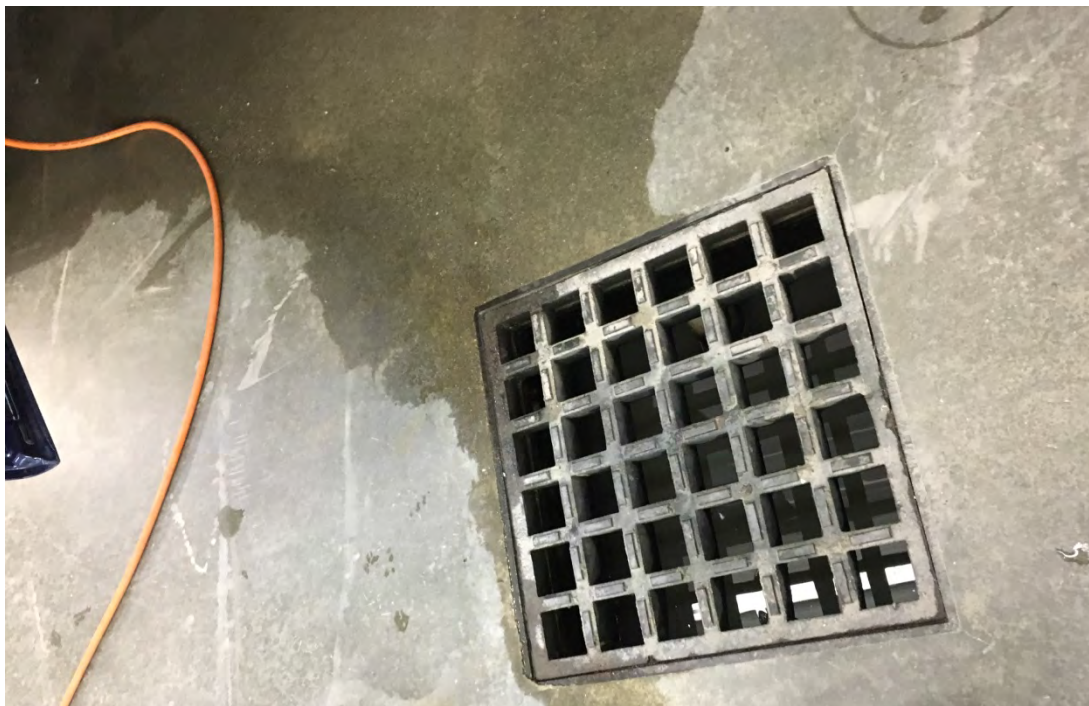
13 Stebbins Street: A floor drain was observed in the floor of the garage. The floor drain reportedly collects the water used to clean cars and is connected to the City Municipal Sewer. Photo taken by Sanborn Head on January 11, 2017.
